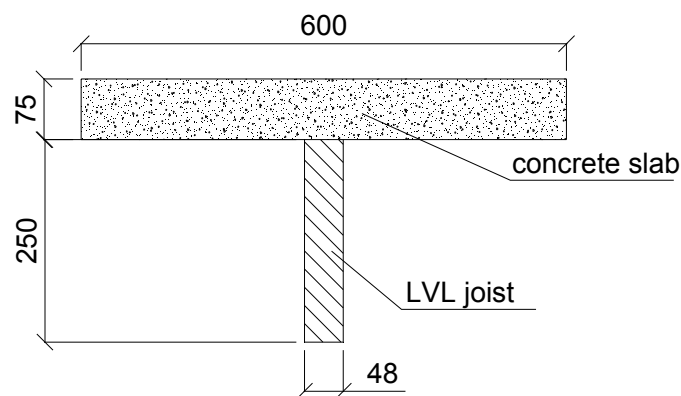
Cross-section of the TCC beam (Typical) (measured in mm).
